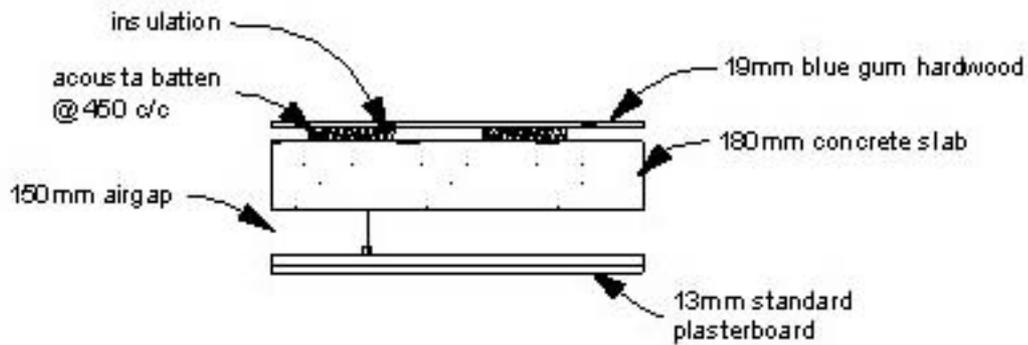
FLOOR DETAIL - TYPE D SYSTEM
